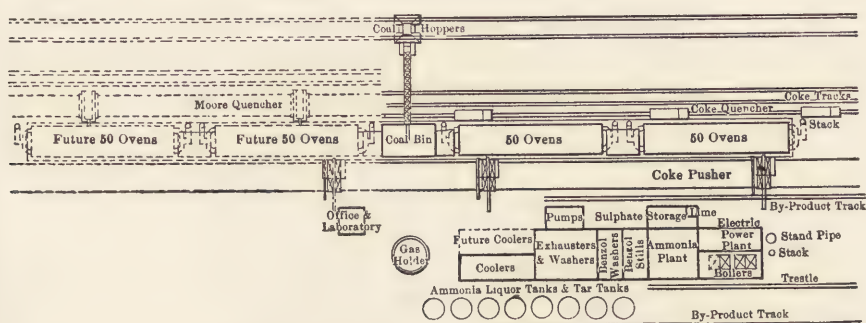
GENERAL ARRANGEMENT OF 100 UNITED-OTTO OVEN PLANT WITH PROVISION FOR EXTENSION TO 200 OVENS. GROUND PLAN.
